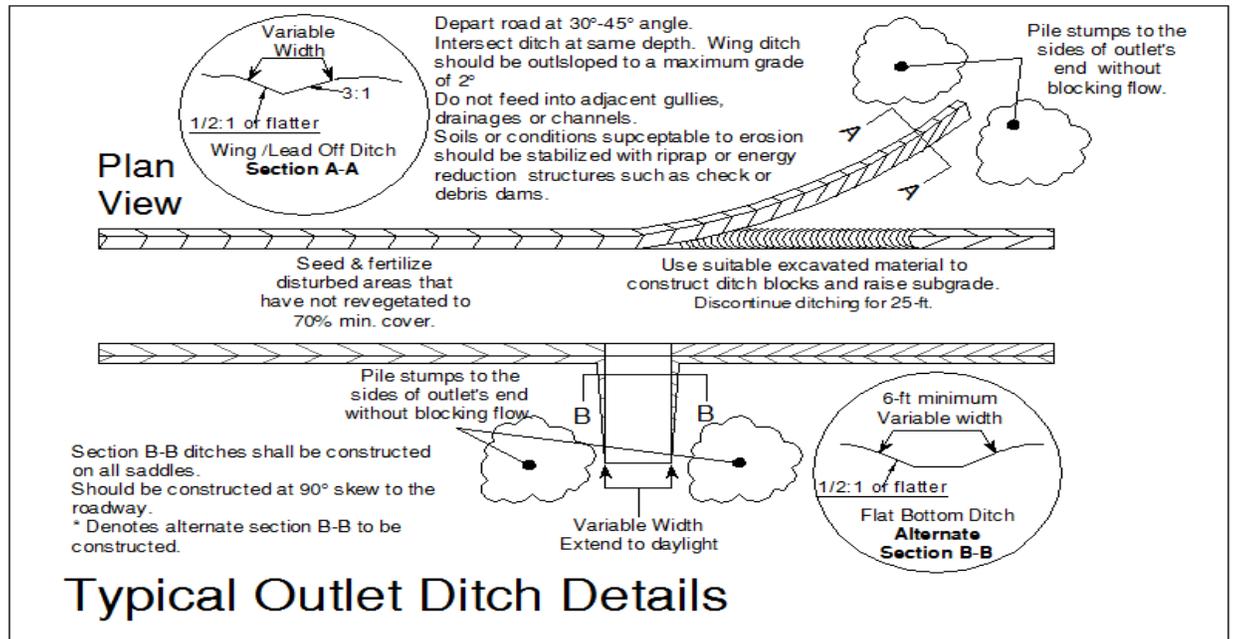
Illustration of A-A and B-B Type Outlet Ditches
